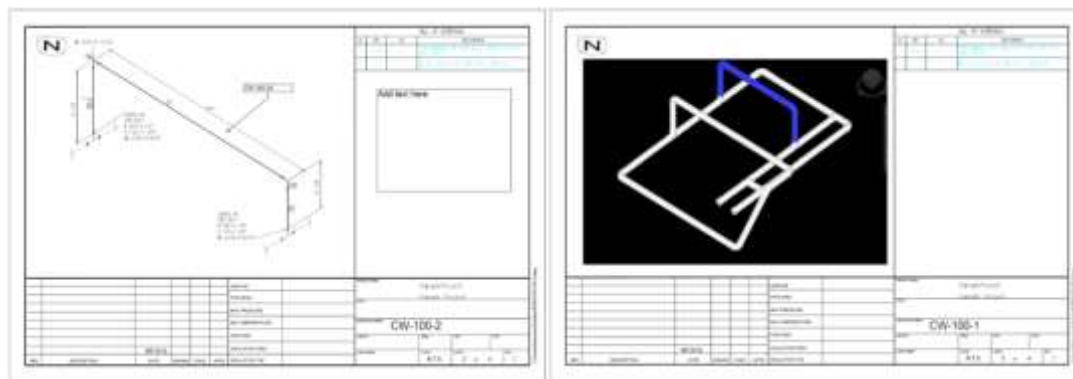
Two-Sided Isometric Drawing - Spool 3
